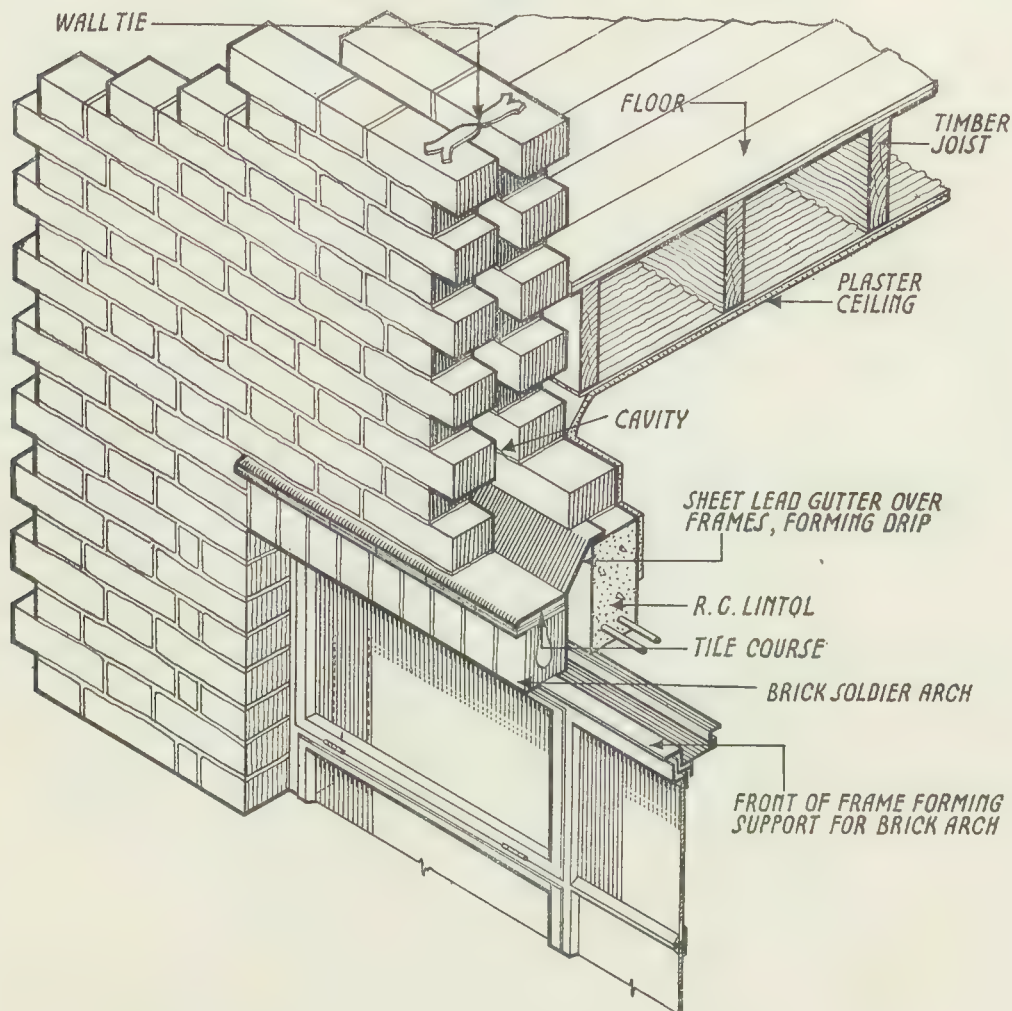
BRICK SOLDIER ARCH SUPPORTED UPON METAL WINDOW FRAME
